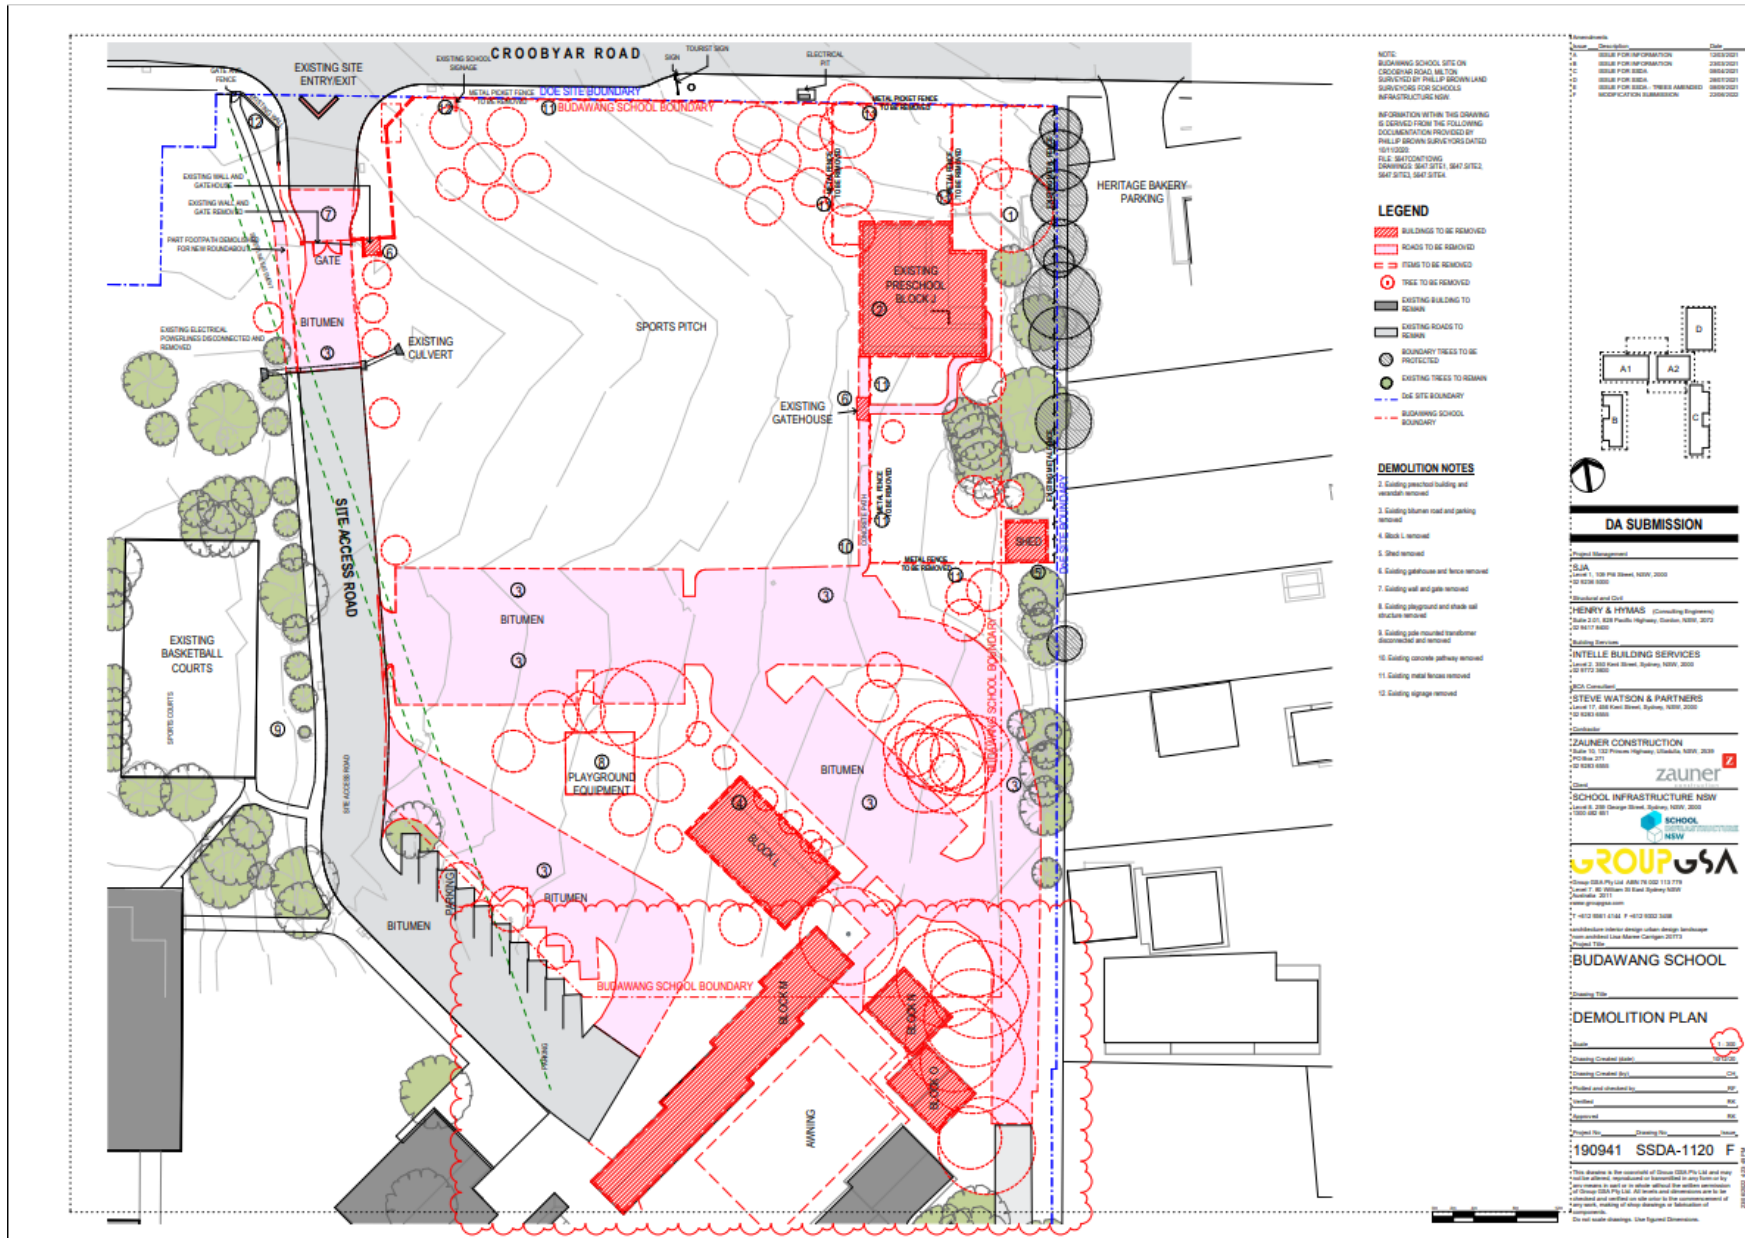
Site demolition plan for proposed modifications to the original Budawang BITUMEN School Development Site
